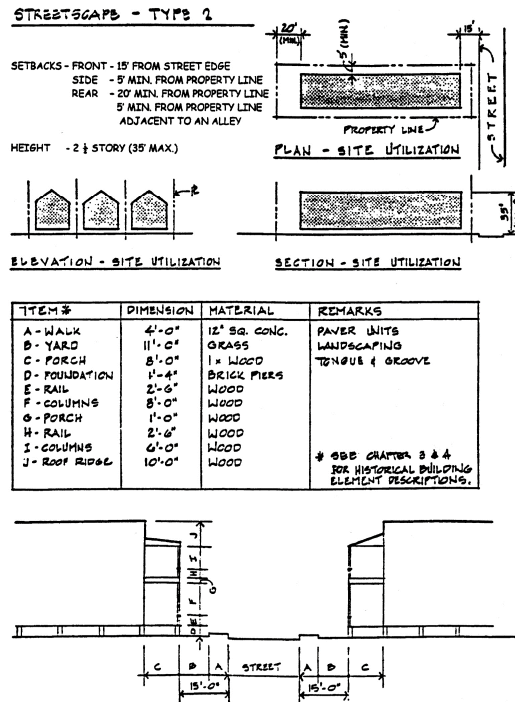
WOOD COTTAGES DISTRICT-STREETSCAPE, TYPE 2
